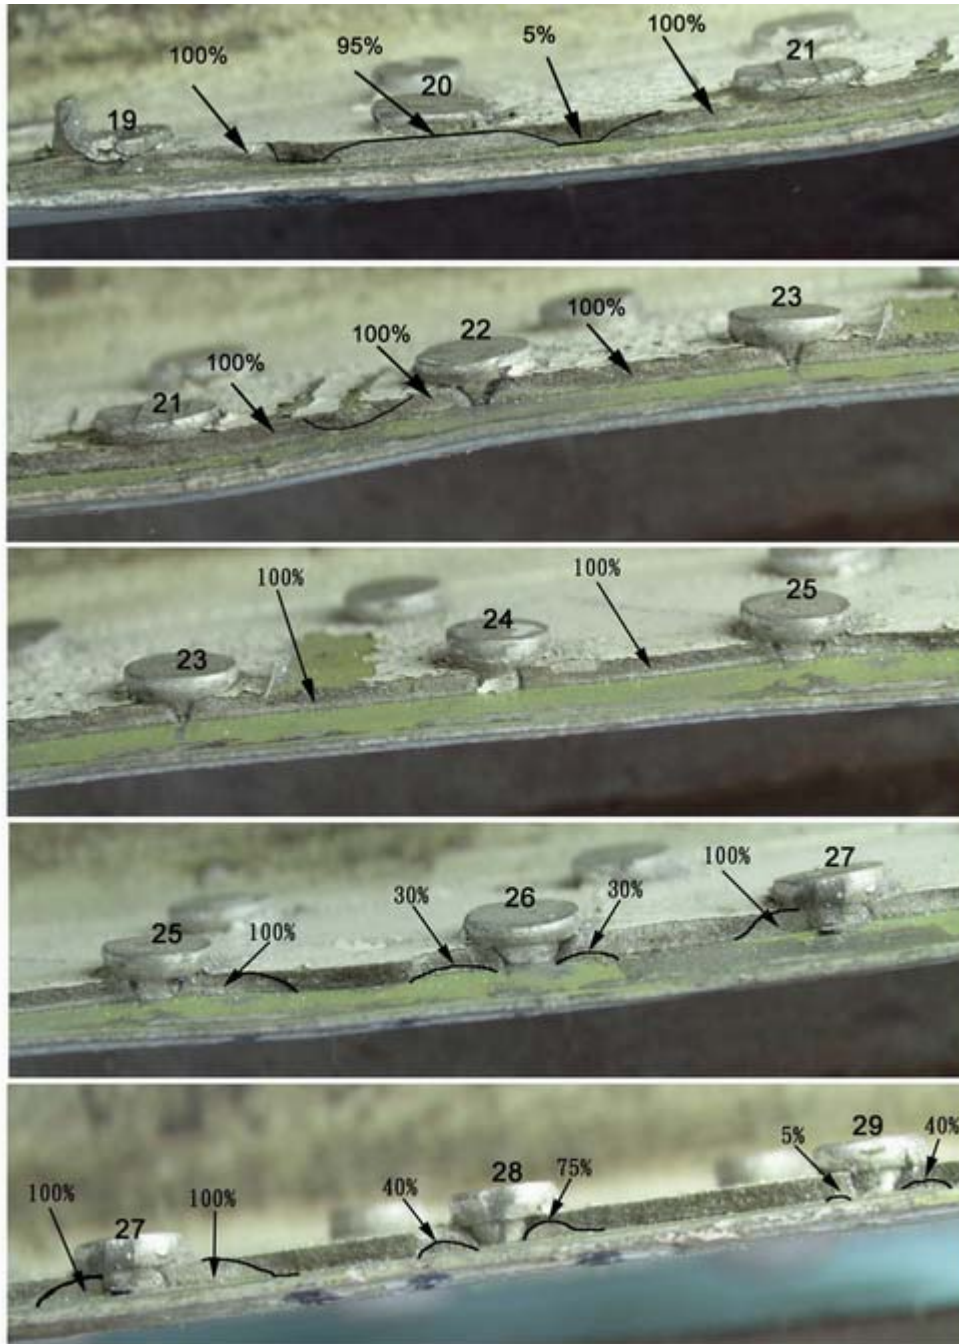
Shown the extent of fatigue cracking
